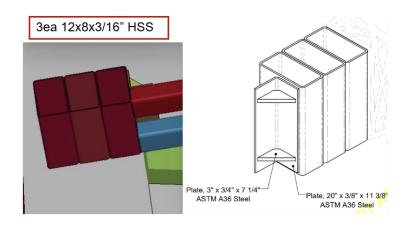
Option 3 – Welded Three Rectangular HSSs
